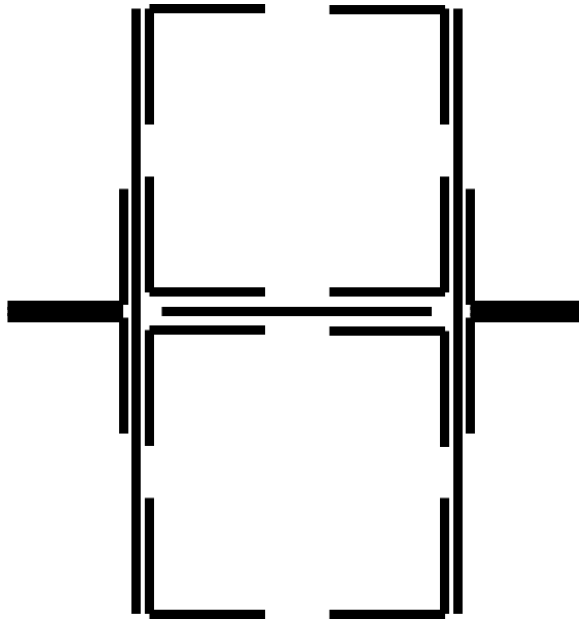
Tower Span Cross Section Showing Guides for Counterweights and Lift Span
